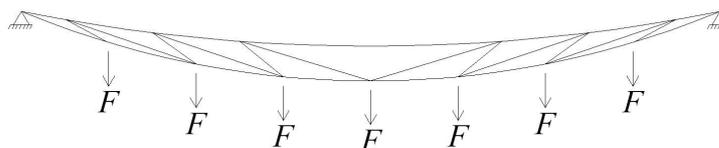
Cable truss with cambered top and bottom chords and inclined web elements
